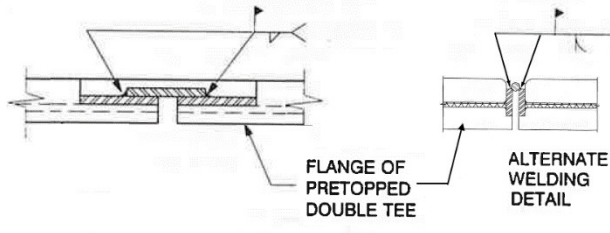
Typical “pretopped” flange to flange connection details from PCI Design Handbook, 5th Edition, 1998.
